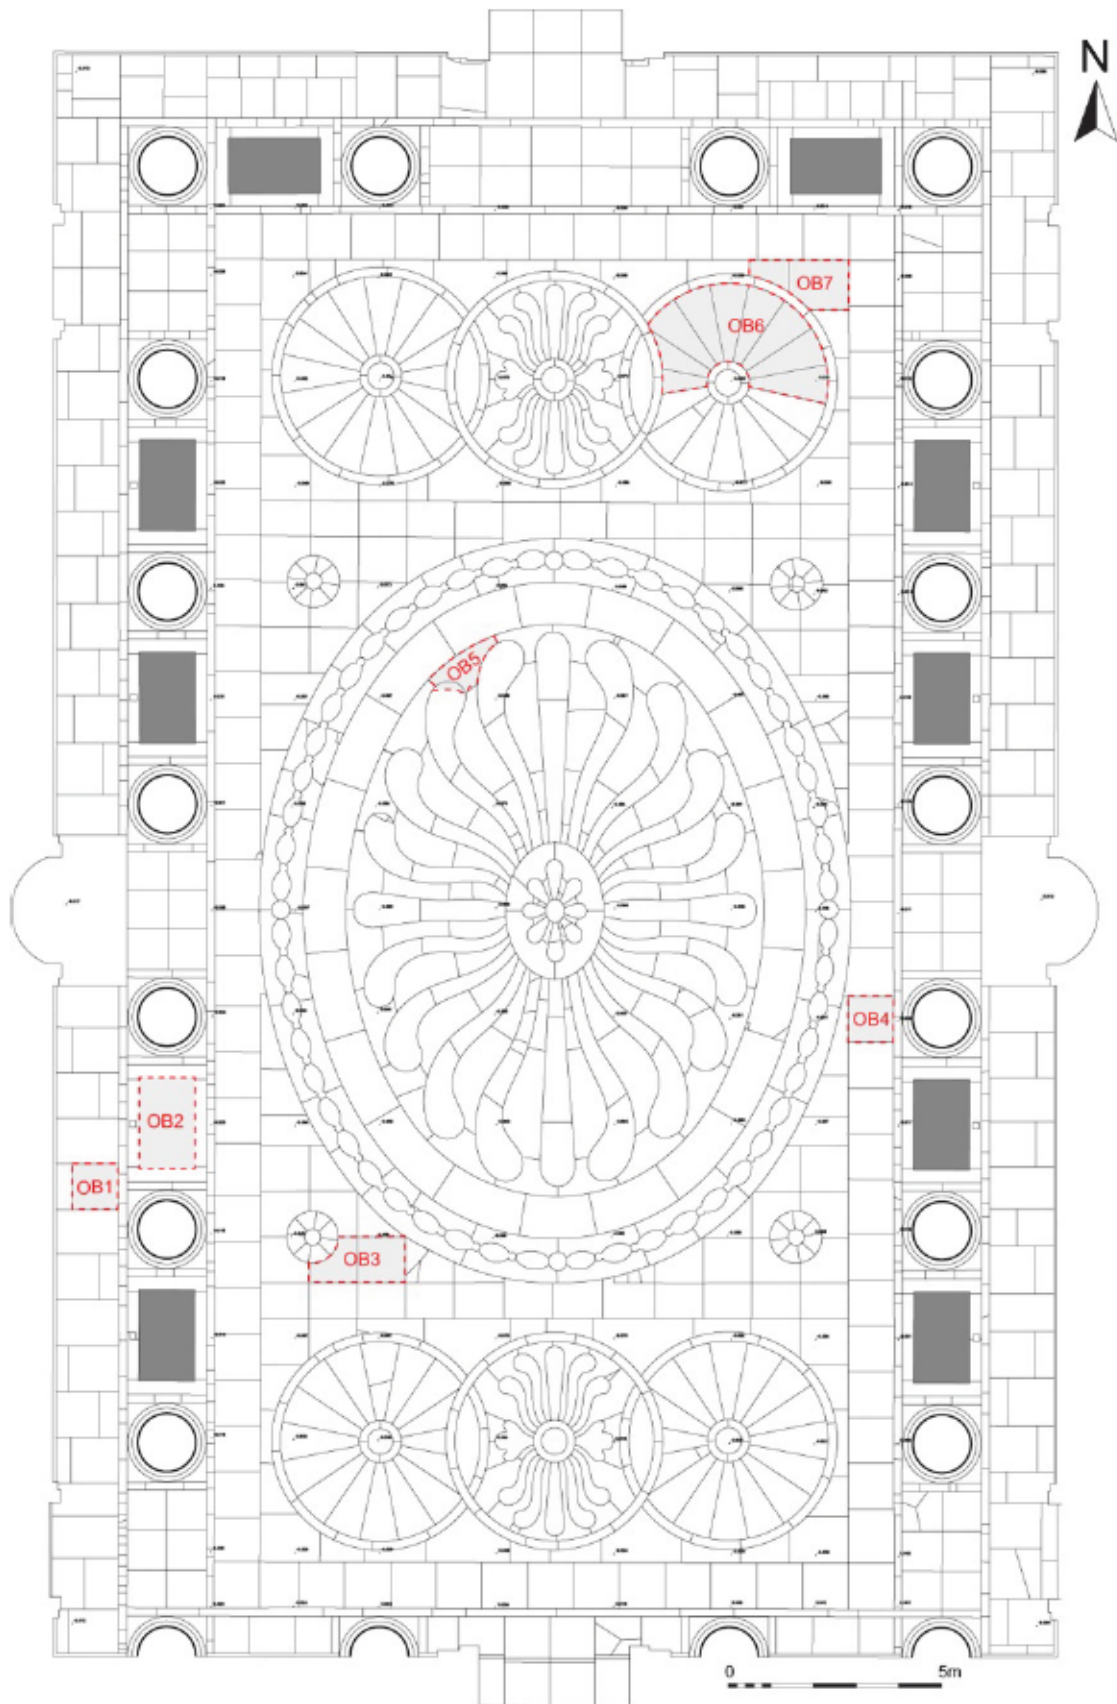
Floor plan of the Marble Hall with locations of archaeological observations
